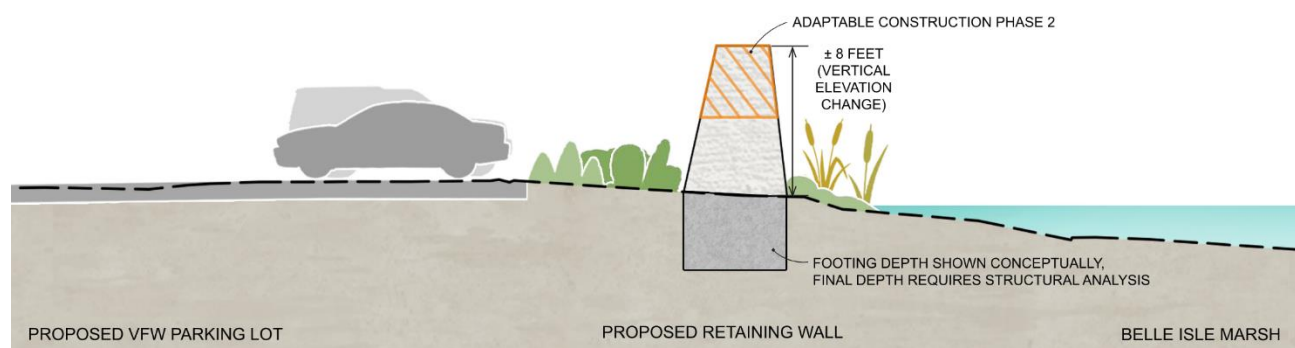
Alternative VFW-2 Adaptive Concrete Retaining Wall—Illustrative Cross Section (Terraink)
